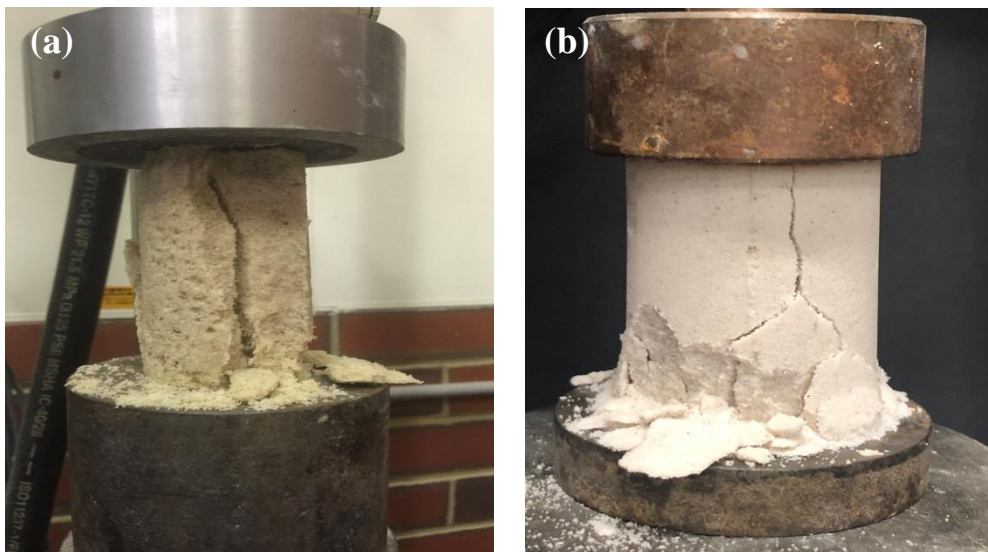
Typical failure modes of the bio-cemented specimens: (a) tension crack (single crack); and (b) local failure (multi cracks)
